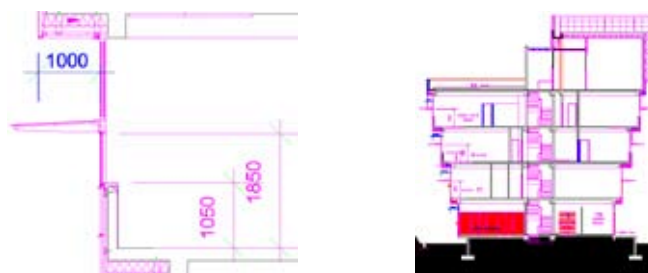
Section of typical facade (left) and section of self-shading building stepping out 1 meter each floor (right)
